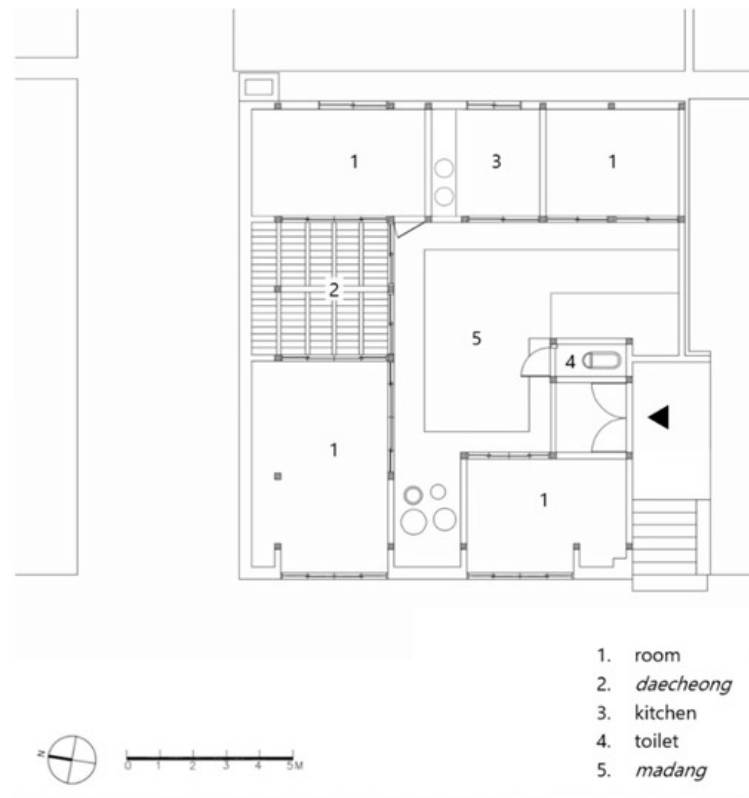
Plausible floor plan of the Samcheong Hanok after extension, probably carried out in the early 1960s (Drawn by the author).
